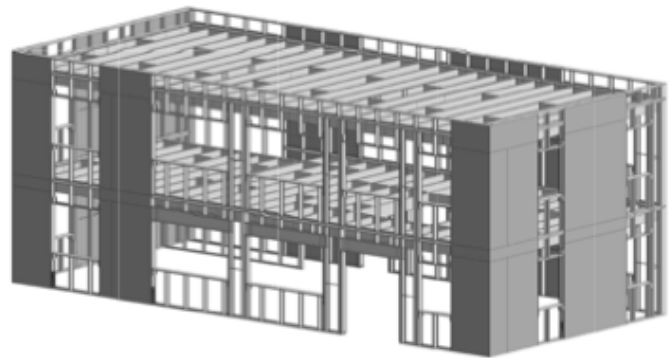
Isometric of framing for 2-story CFS-NEES building (sheathing depicted only on shear walls) [17].
